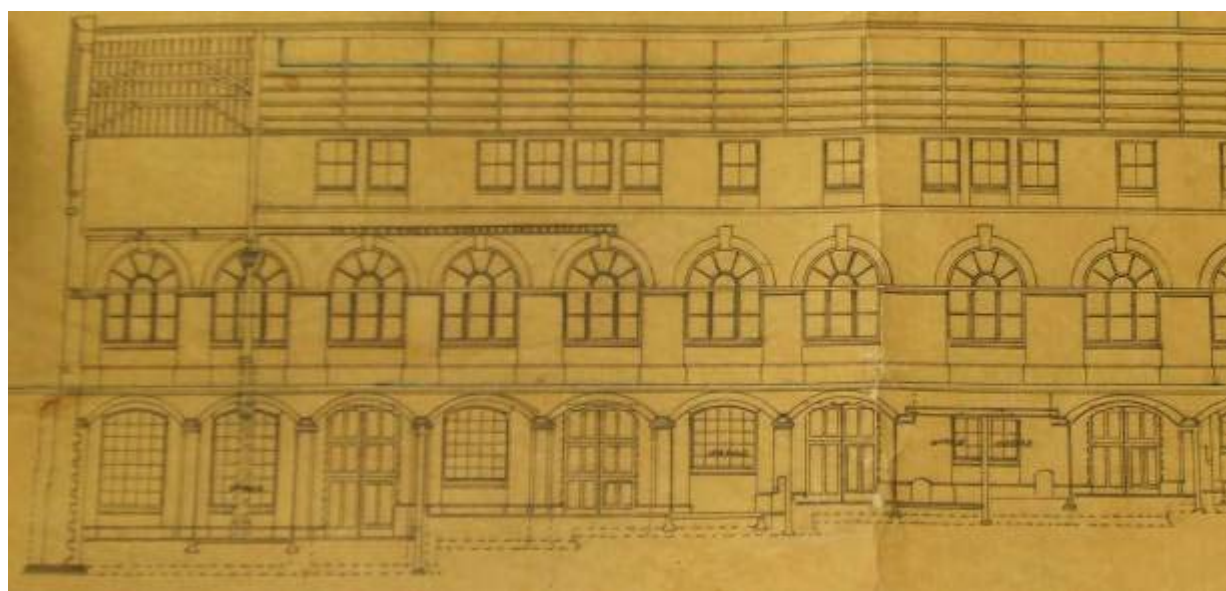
Internal section south facing through building, 1866, showing office space and iron columns extending to upper floors
